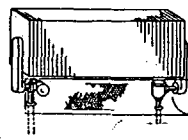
FIN TYPE RADIATOR VALVES BEHIND GRILLE
